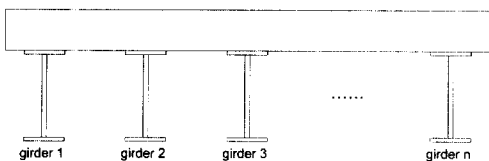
The Cross Section of Concrete Slab Steel Girder Bridge
